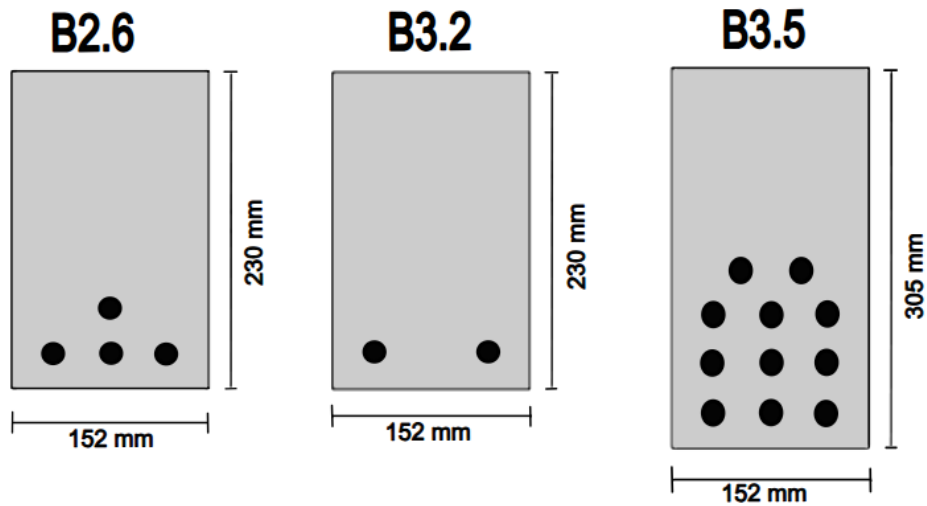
Cross sections geometries B2.6, B3.2 and B3.5
